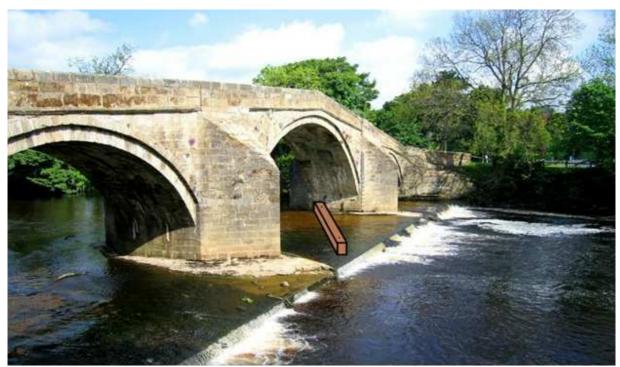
A simple diagonal baulk located in the centre bridge arch would increase water depth and aid fish passage.
